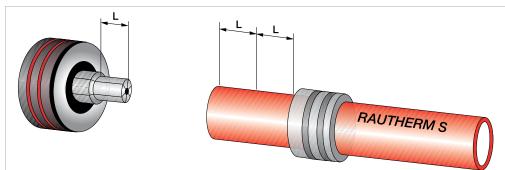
Expanding head with red marking for RAUTHERM S 17–25 heating pipes
